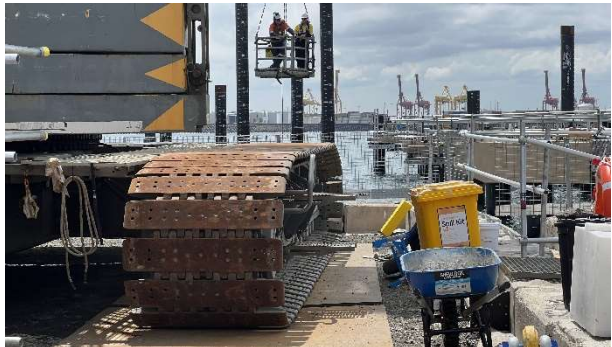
La Perouse ramp construction - Site tightly constrained. Erosion and sediment controls in place.
